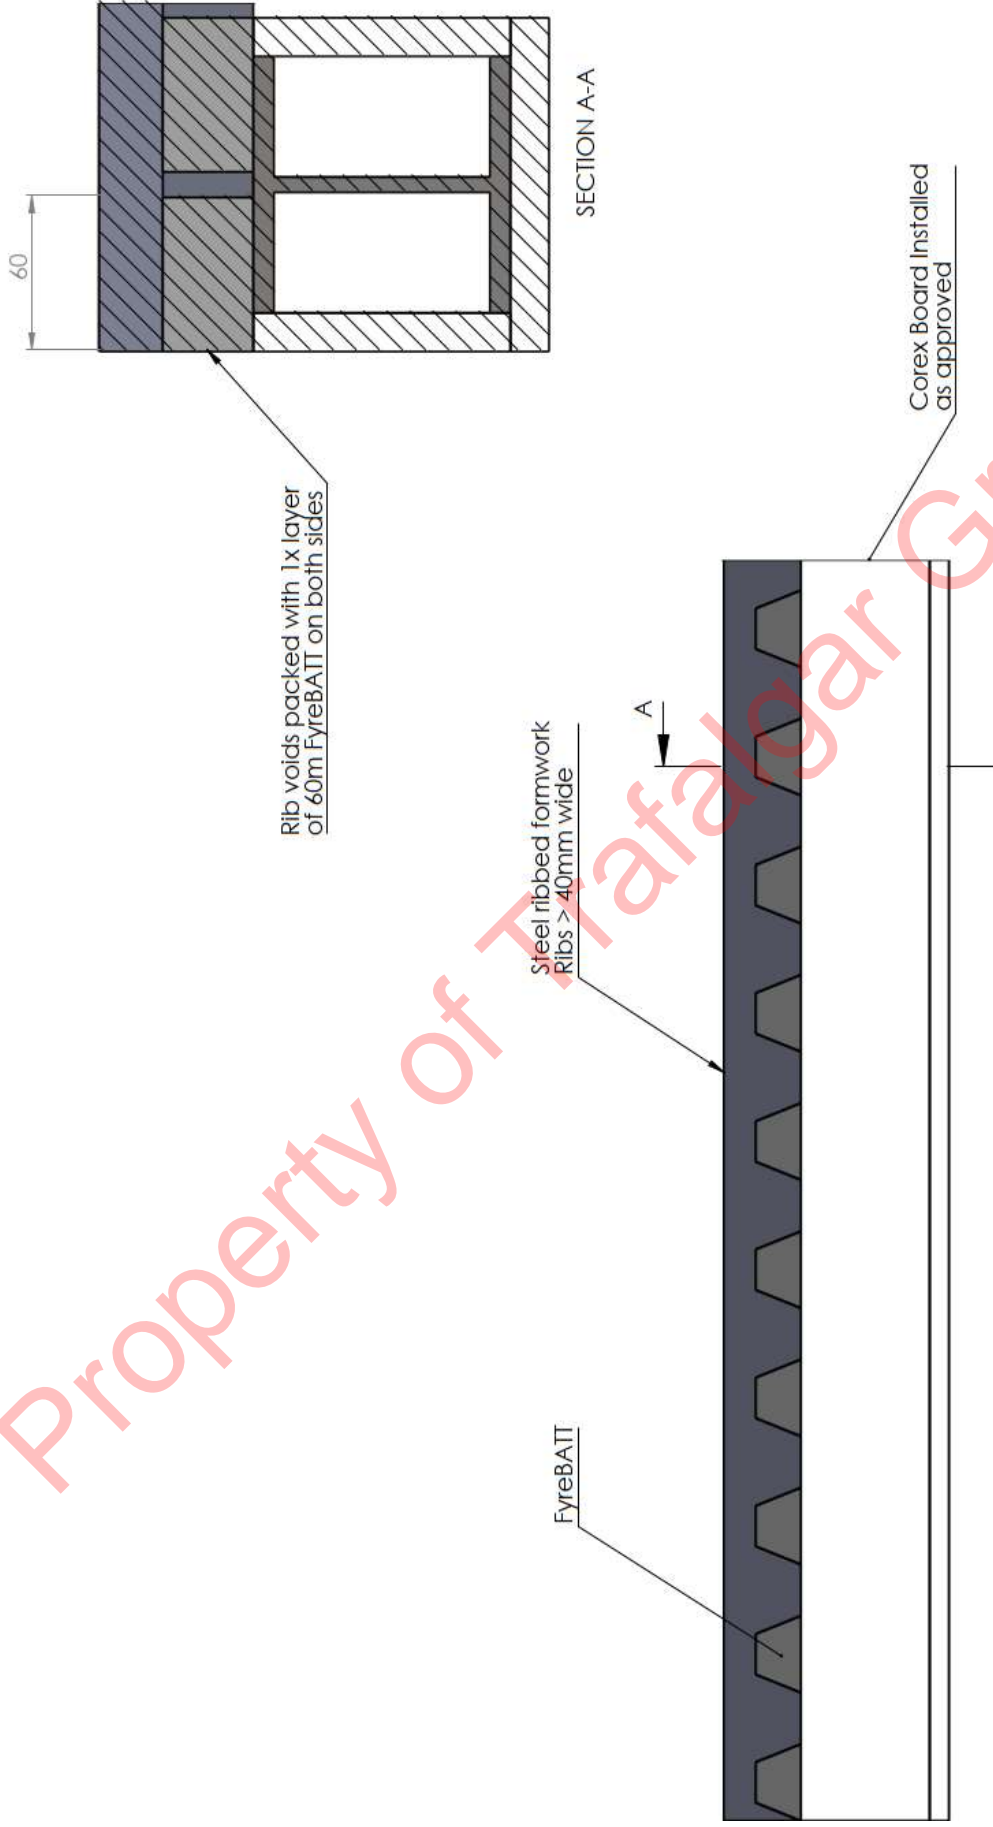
The construction detail of protected beam perpendicular to the voids of a composite floor slab with ribs (> 40 mm) packed with Trafalgar FyreBATT along the length of the beam
